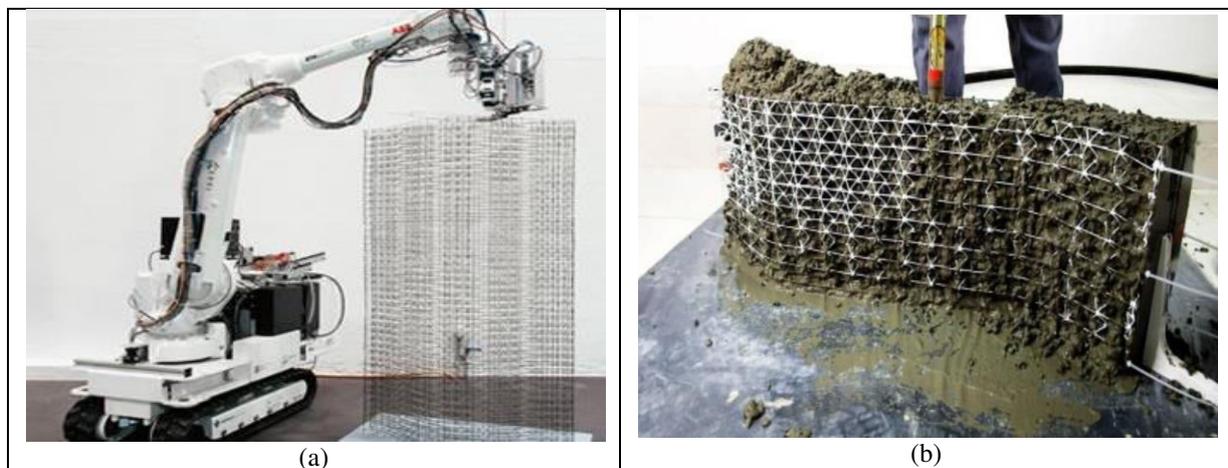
The project “Mesh Mould”: (a) creation of steel reinforcement cage; (b) the process of laying concrete mix.
